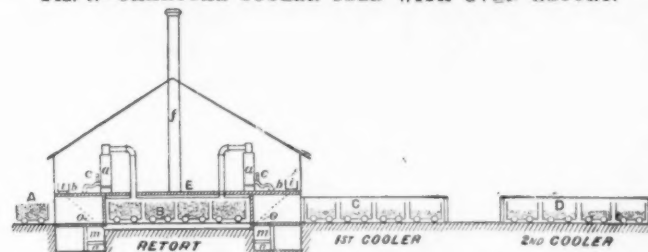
PLAN OF A MODERN AMERICAN DESTRUCTIVE DISTILLATION PLANT.
